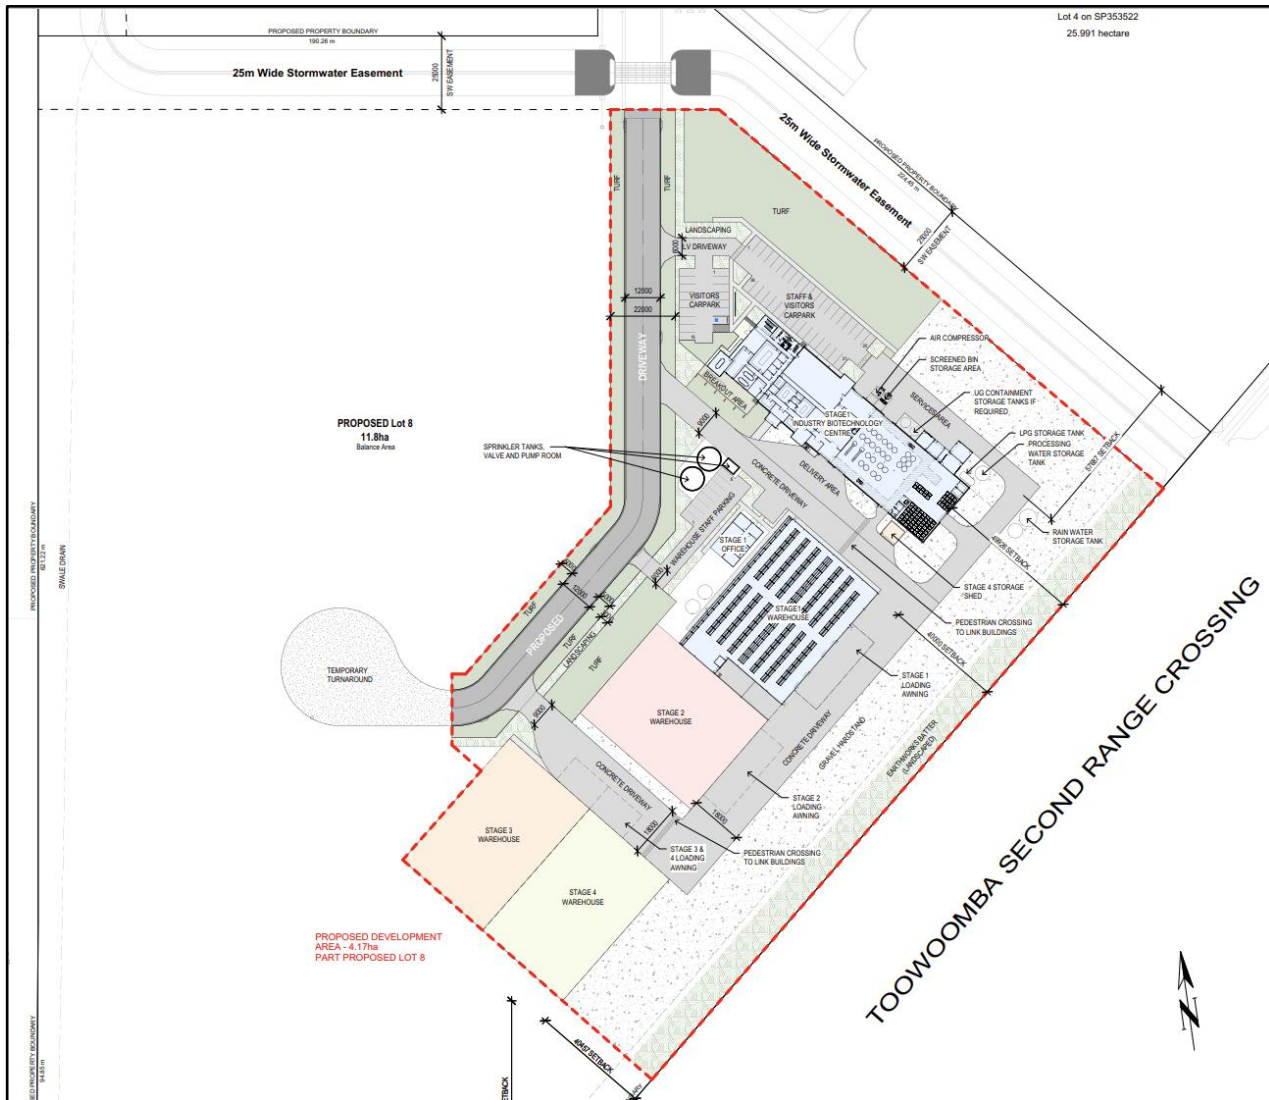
SITE CONTOUR LAYOUT (KEHOE MYERS DRAWING NO. C2324371-BEW01)
